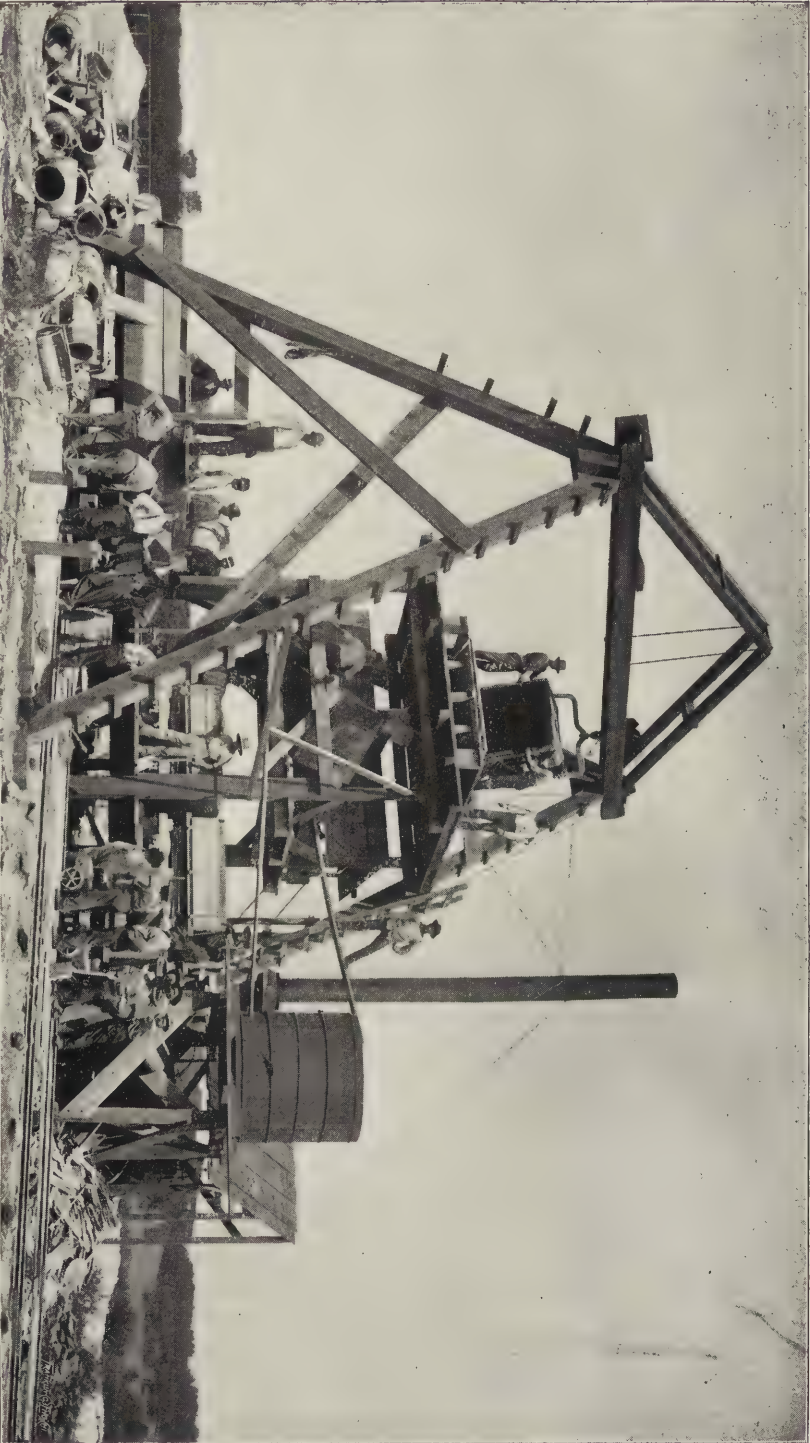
PLATE II. CONCRETE MIXER, HENNEPIN CANAL.
